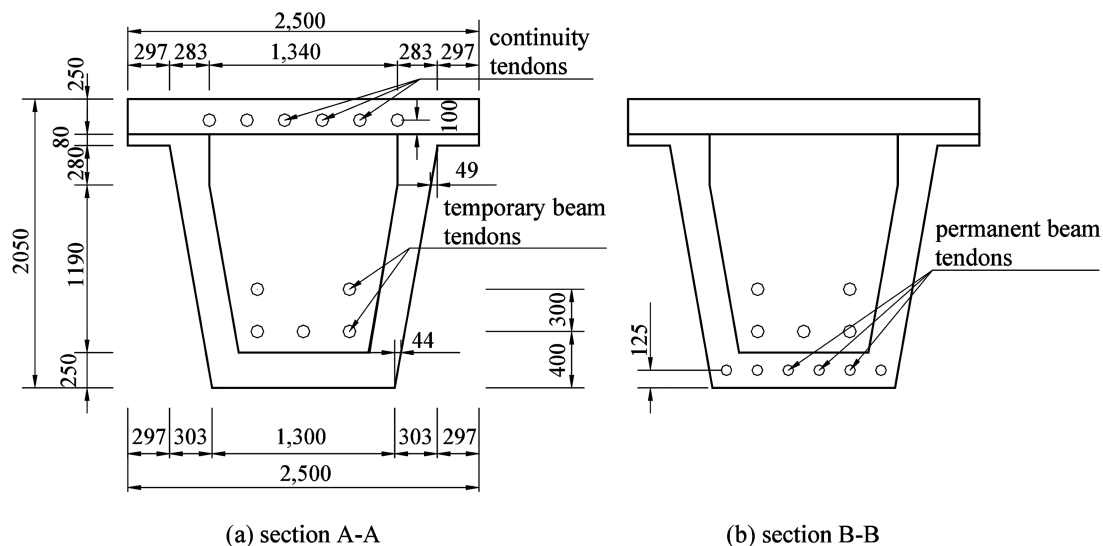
Typical girder sections in 40-m span (see to Fig. 4, unit: mm)
